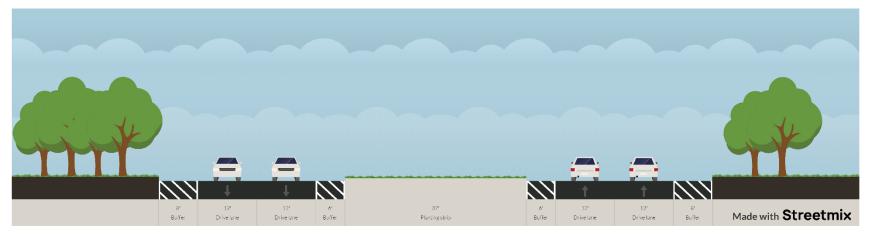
Proposed Action Typical Section, John James Audubon Parkway Near Bryant Woods
